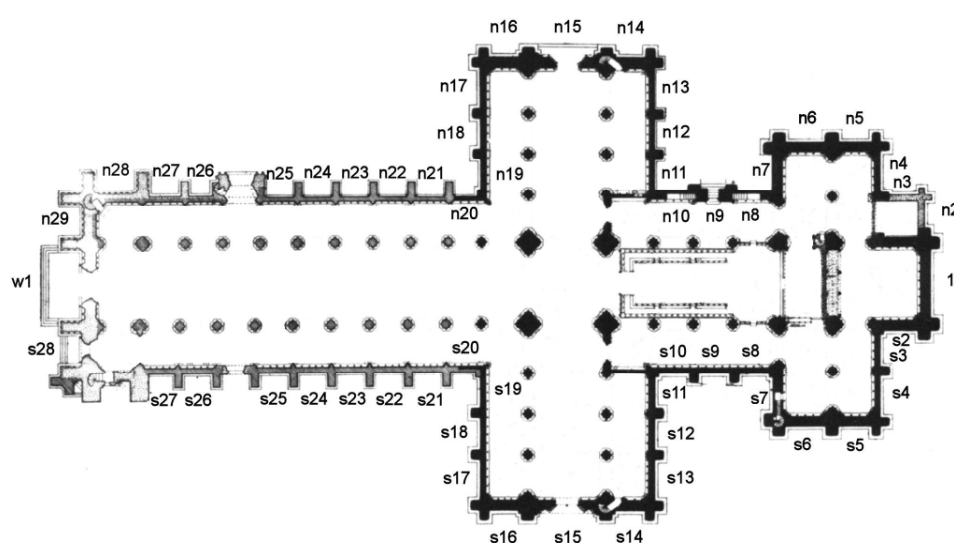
Ground plan of Beverley Minster with windows numbered according to the CVMA system
